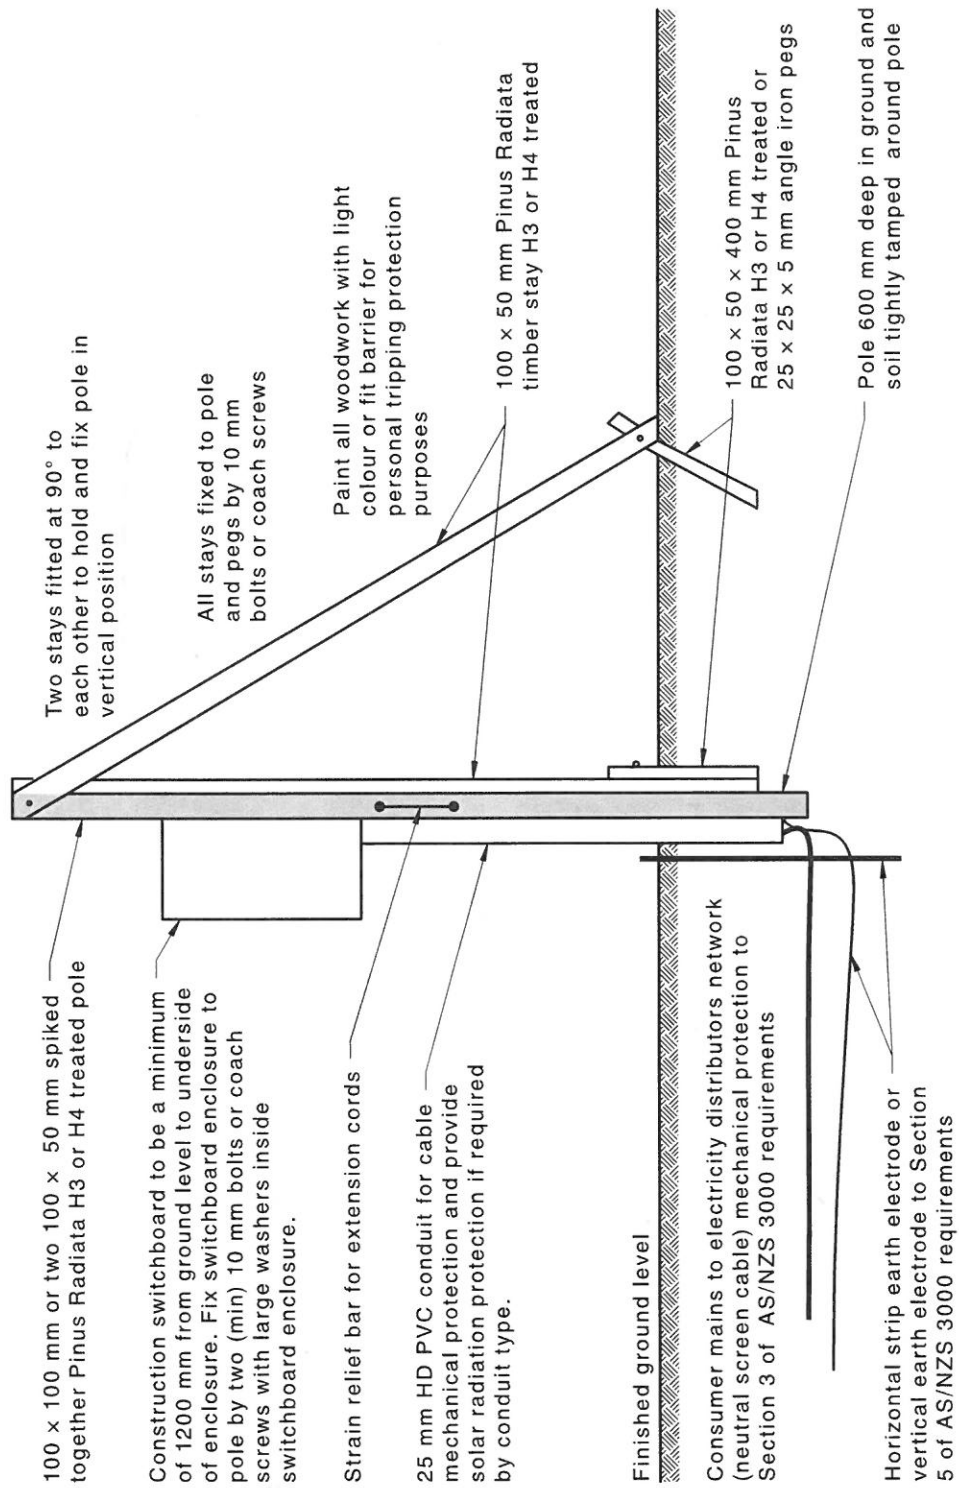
TYPICAL CONSTRUCTION SWITCHBOARD MOUNTING ARRANGEMENT WITH UNDERGROUND SUPPLY CONNECTION
